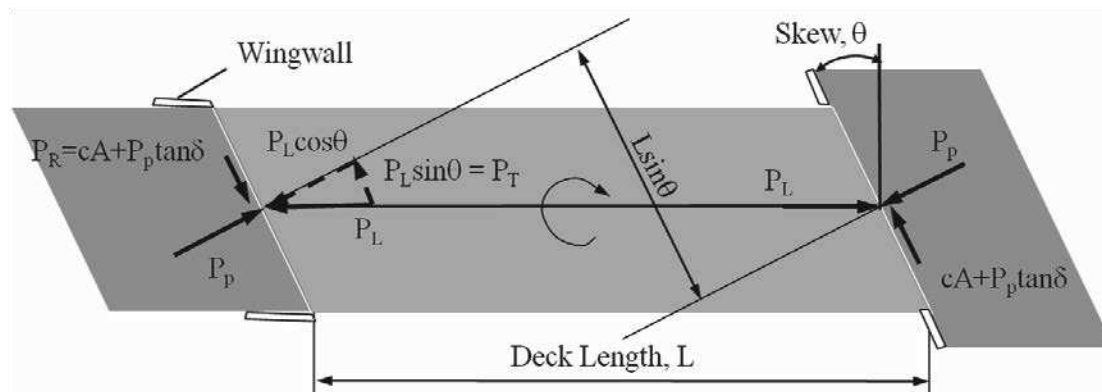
Illustration of forces acting on a skewed bridge at the soil-abutment interface
